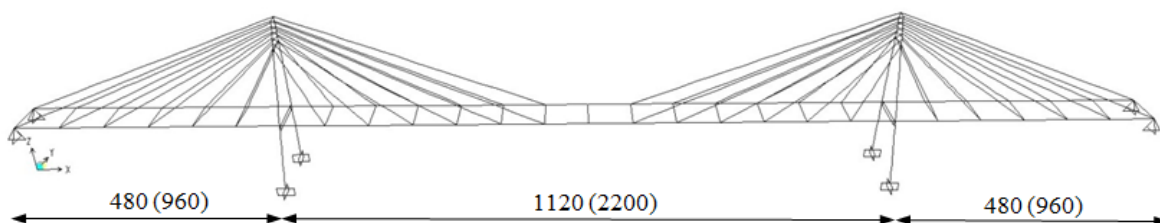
Cable and deck configuration of Bridge I (Bridge II), units: ft.
